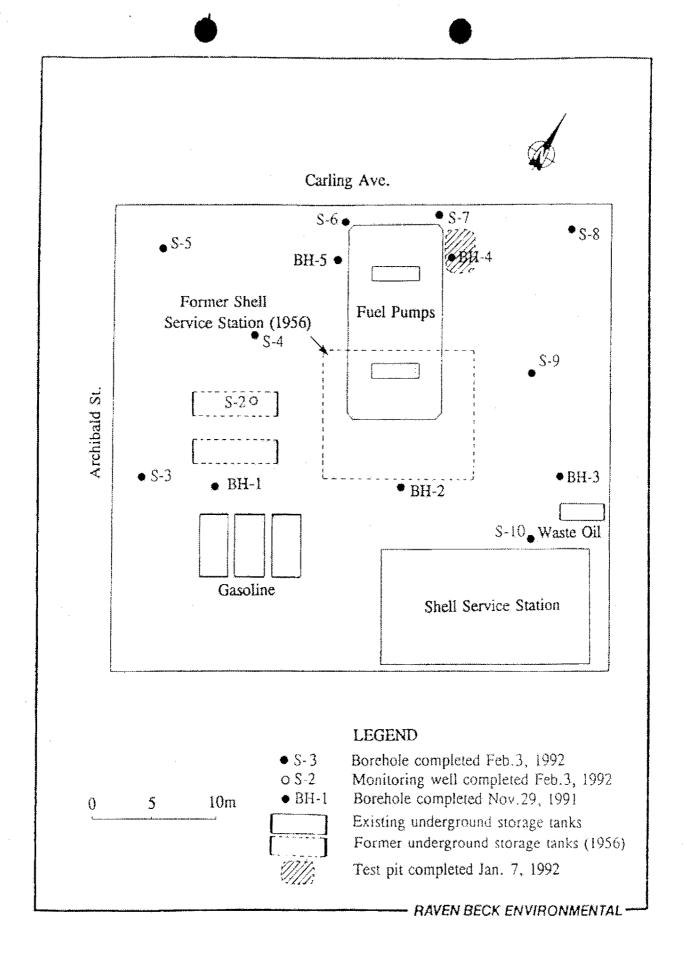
Site Plan of Shell Service Station, 1330 Carling Avenue
